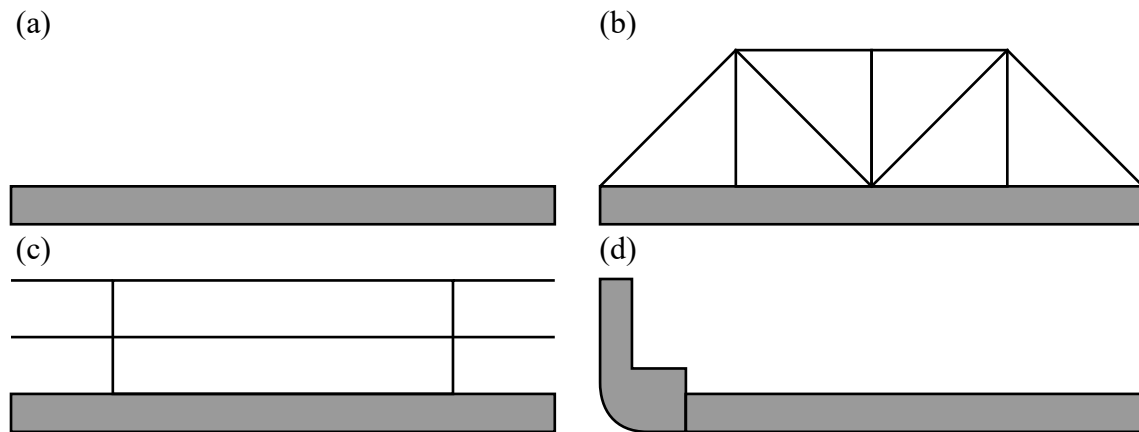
Tested bridge types; Frontal view of (a) reference bridge, (b) truss bridge, (c) railing bridge, and side view of (d) baffle bridge (adapted from Schmocker and Hager 2011)
